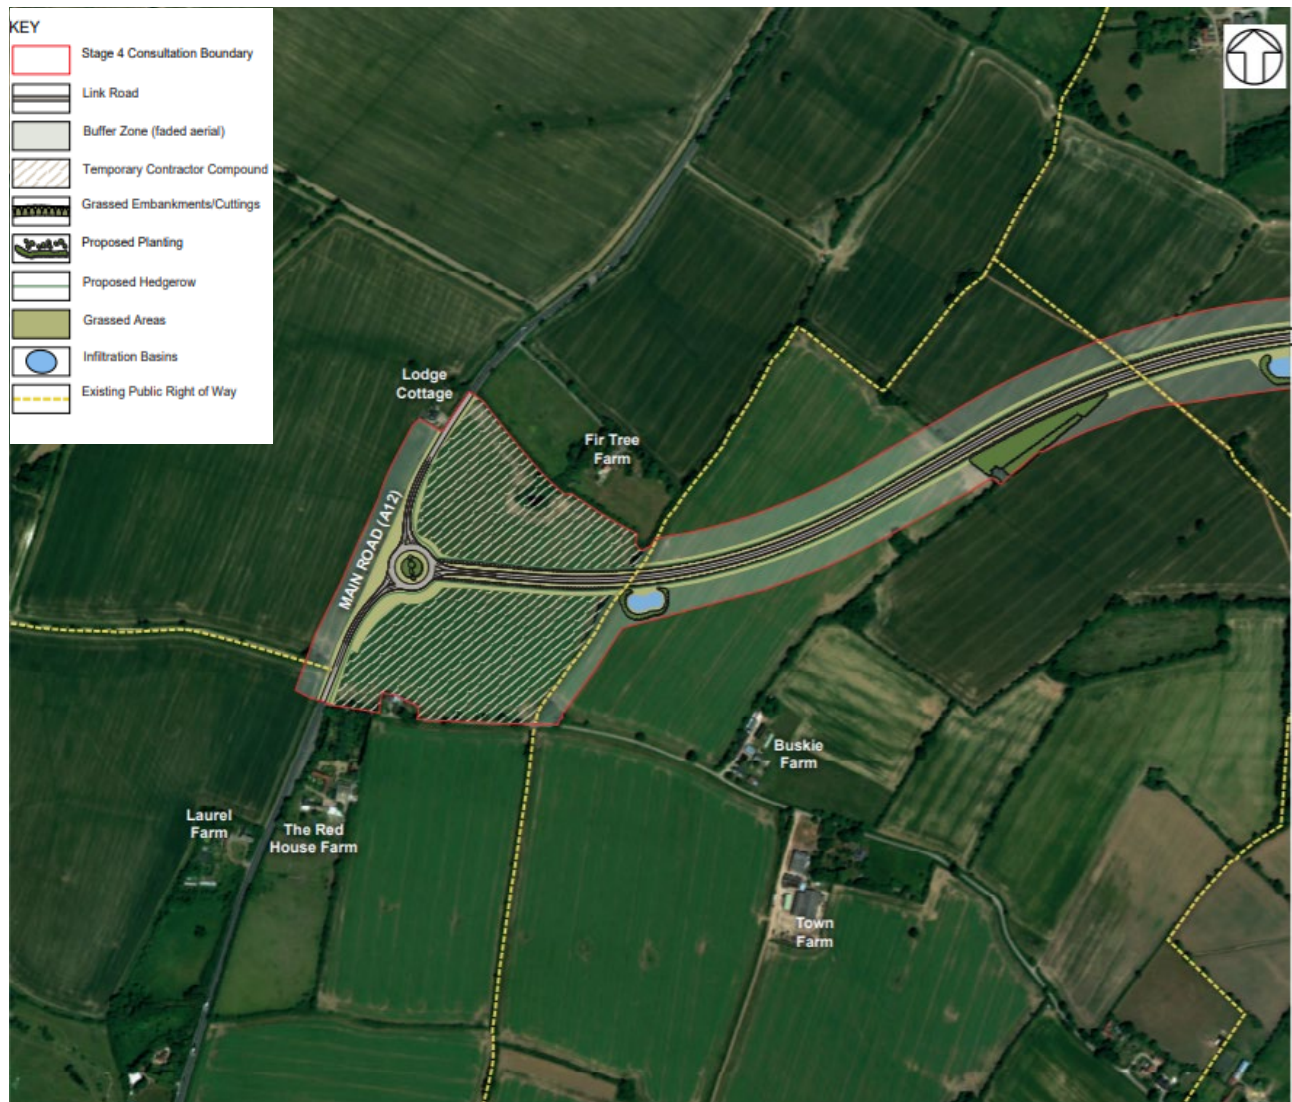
Stage 4: Indicative Sizewell link road masterplan Area 2
